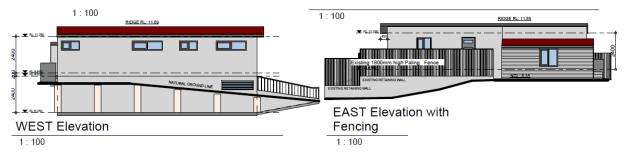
Western and Eastern Elevation. Source: Advanced Architecture & Construction
